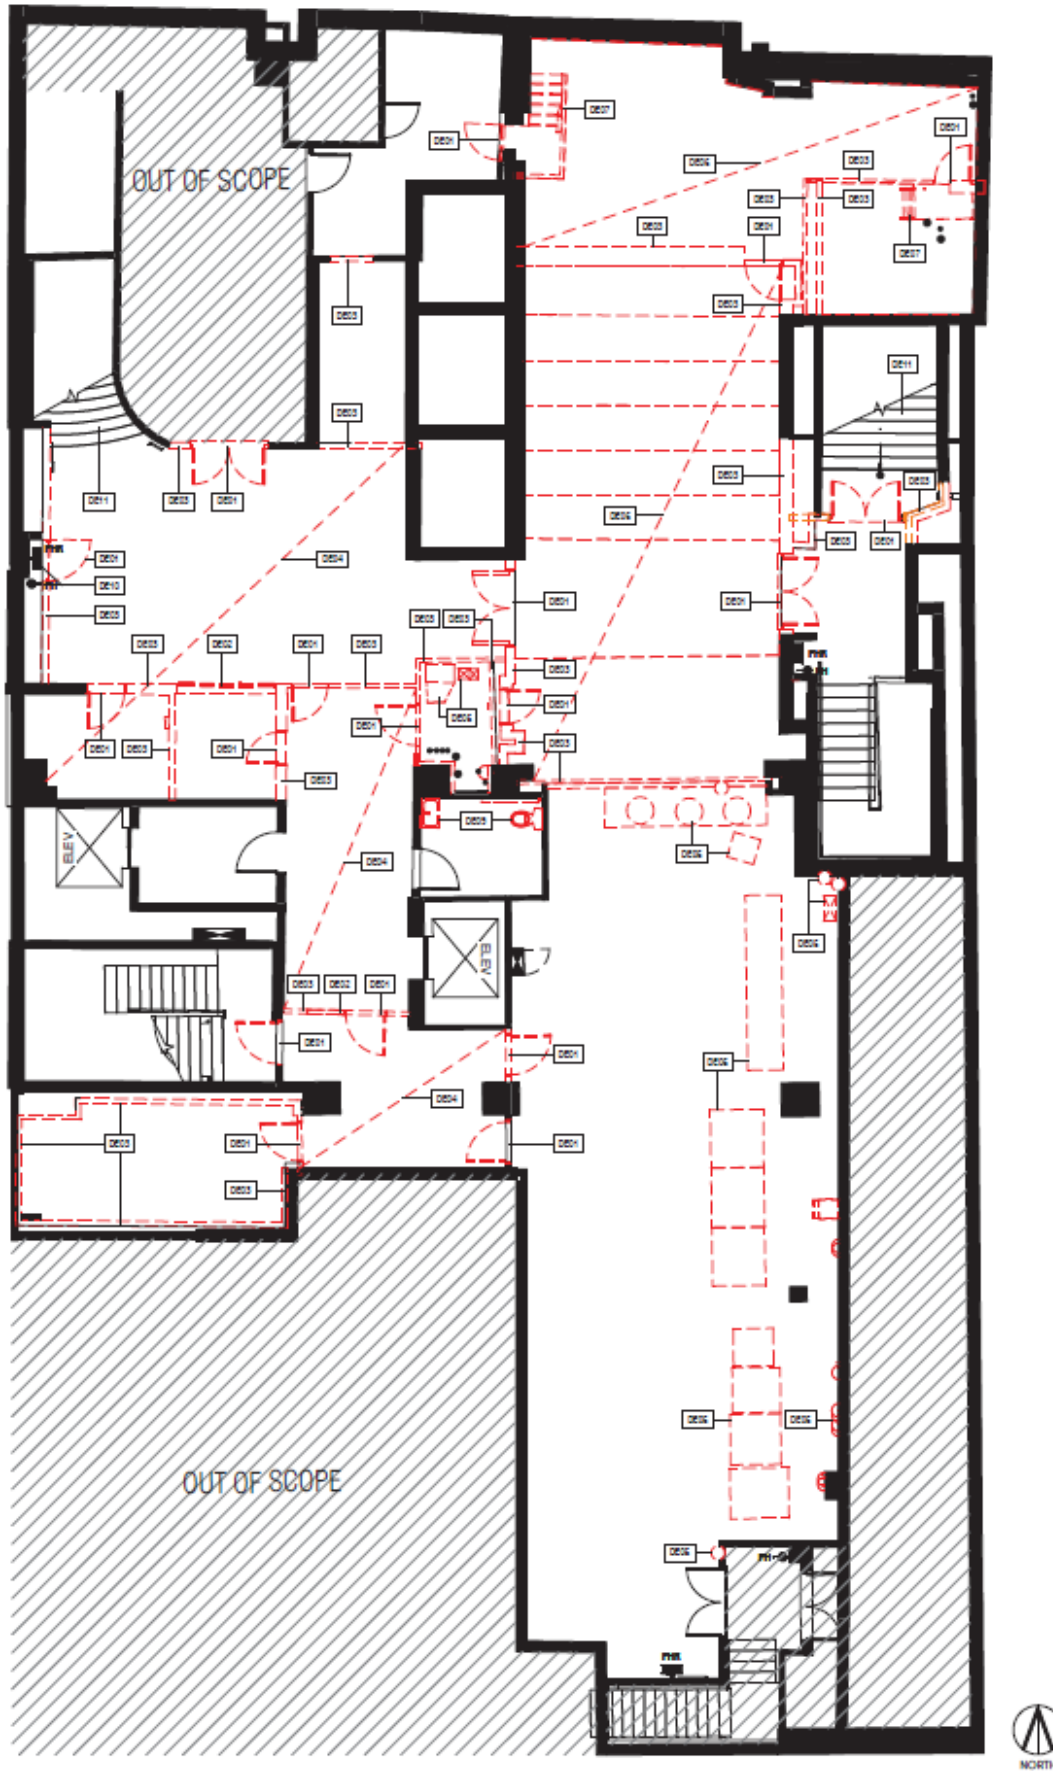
Extract of proposed lower ground floor demolition floorplan (left)
